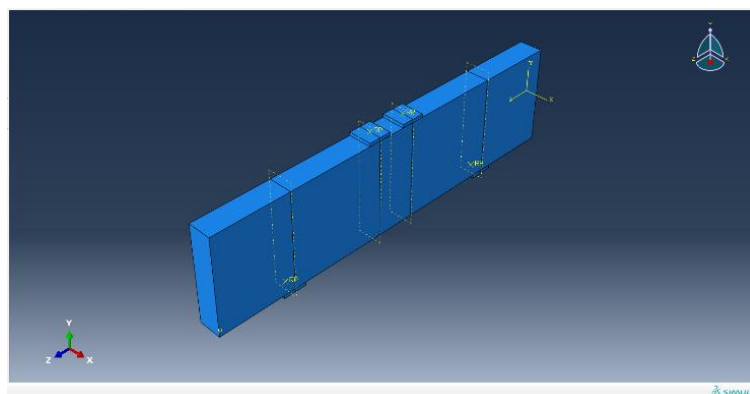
Assembly of Simply supported concrete deep beam, CFRP reinforcement and bearing plates.
